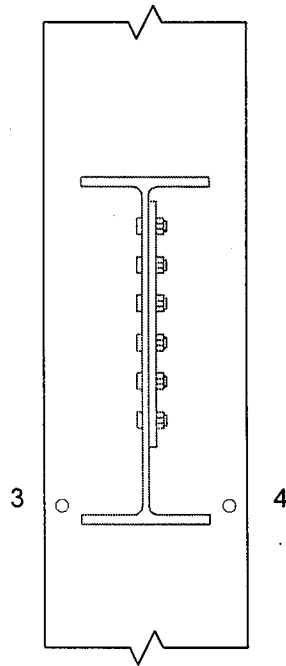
AE Transducer Locations (West Connection of Specimen 1)
